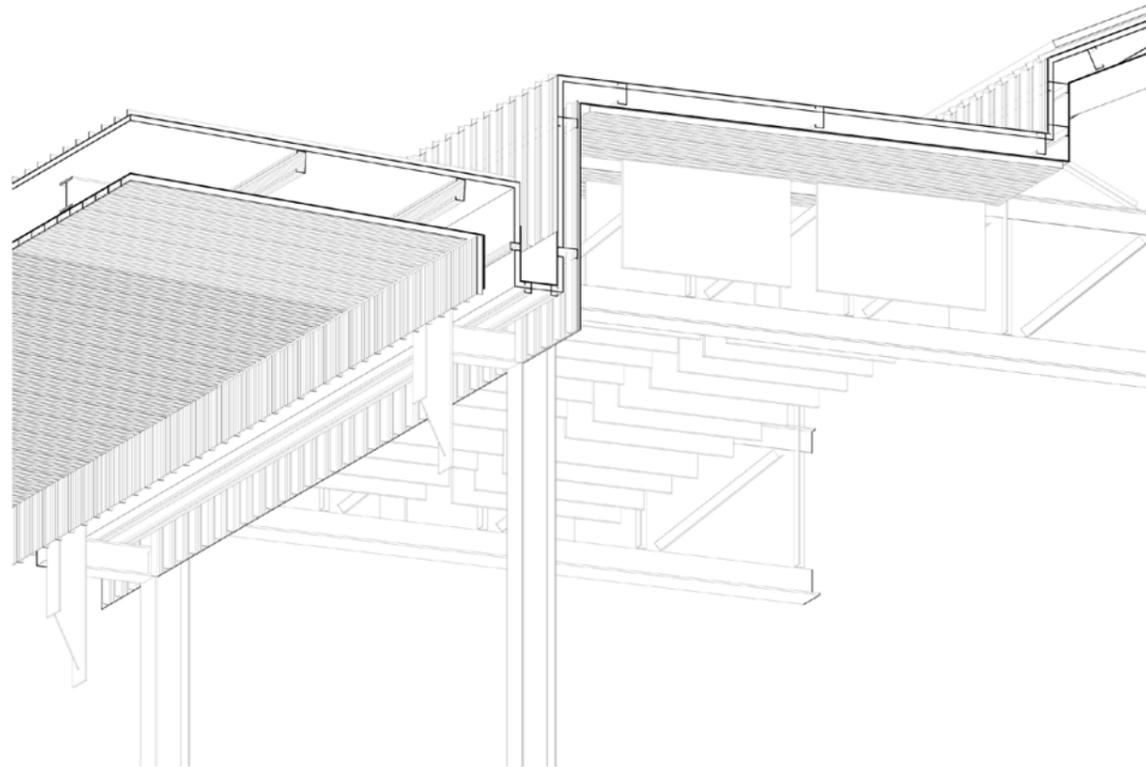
Revit sketches: detail development of suspended portal frames (Author 2013)
